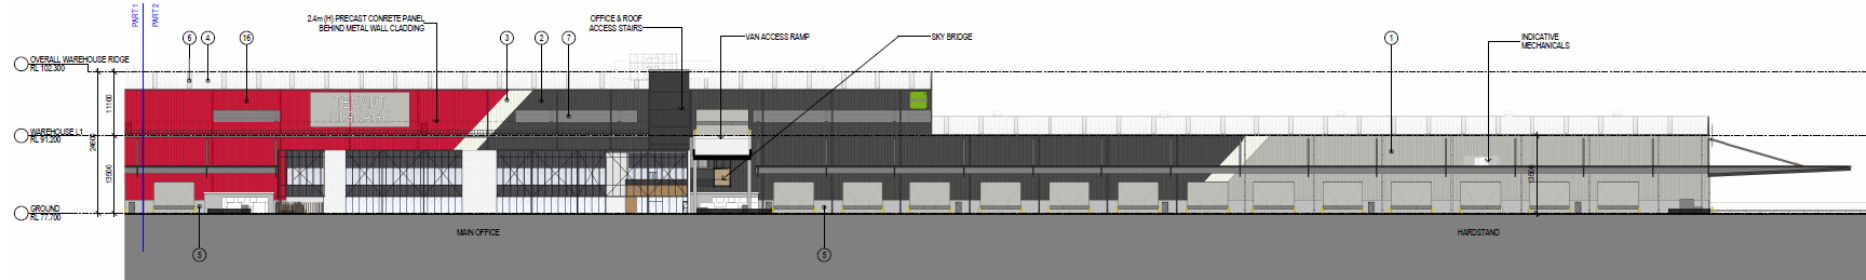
Proposed Building 2B elevations (Source: Goodman)
